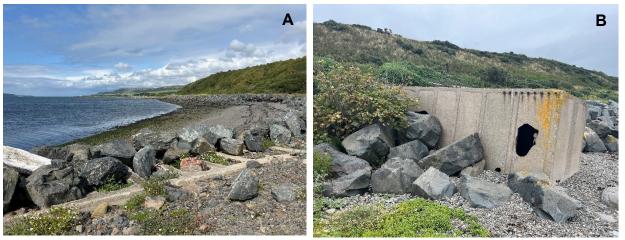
A. Reinforced concrete pontoon section repurposed within modern rock armour, Innermessan [SCAPE ID: <u>15815</u>]; B. Reinforced concrete pontoon section placed within modern rock armour, c480m north of Innermessan Military Railway site [SCAPE ID: <u>16268</u>].
